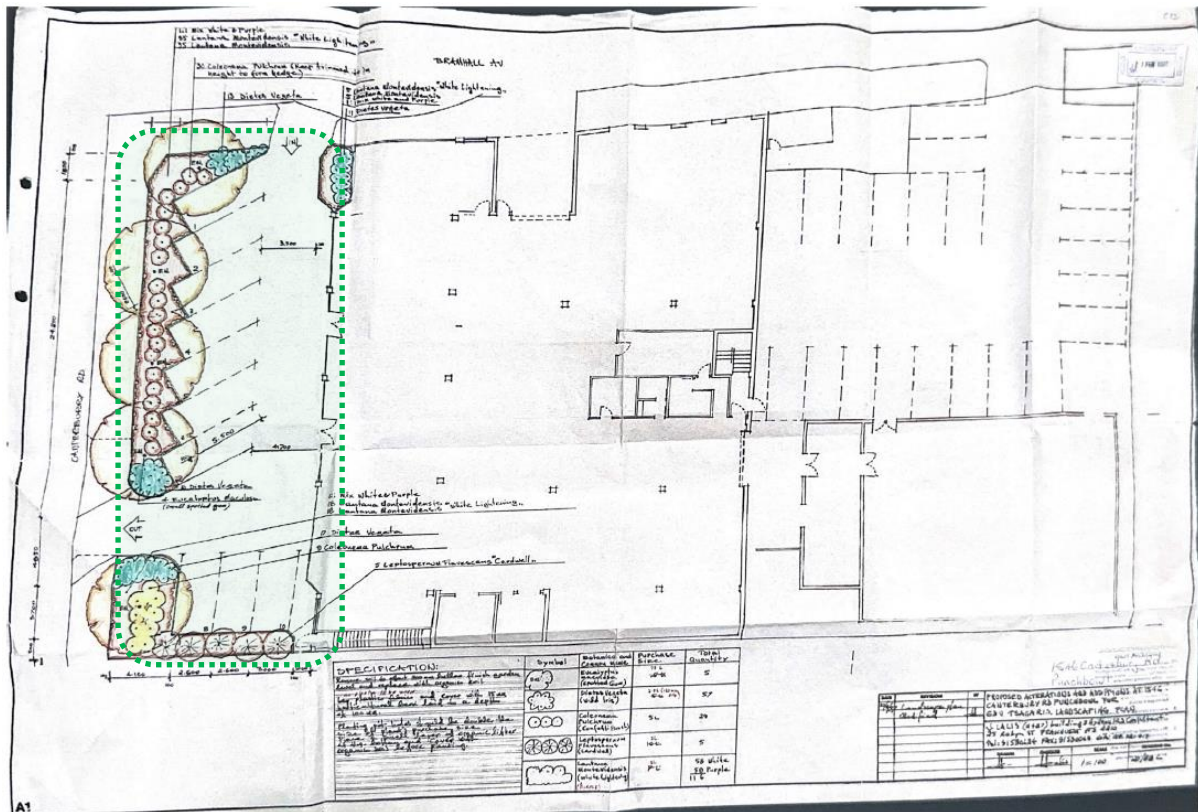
M6317/96 Site Plan with 1 reduced parking space (front parking) *Source: Council
